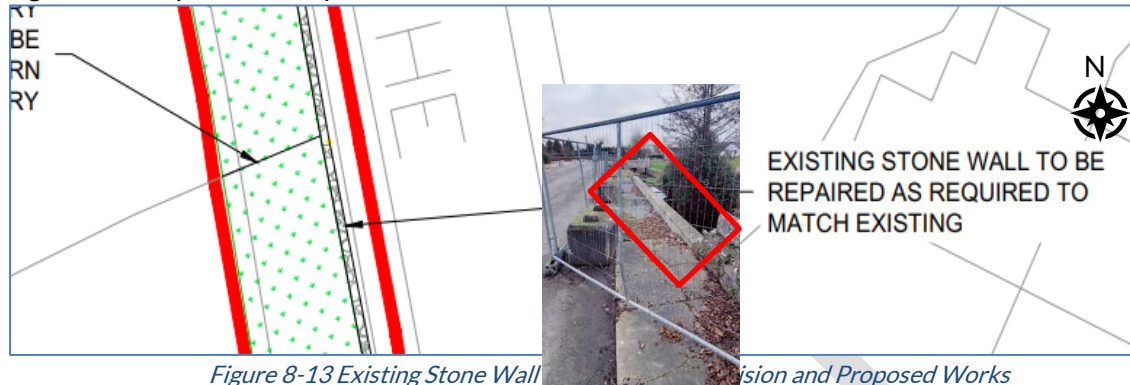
Existing Stone Wall Condition and Proposed Works
